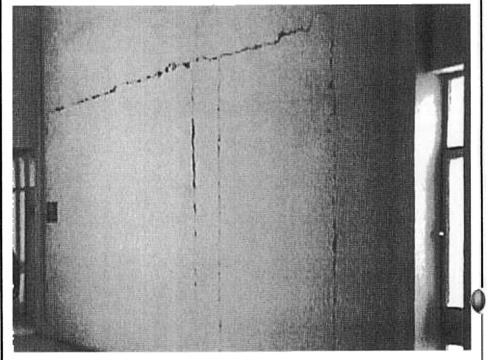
Separation of infill walls at the Çukurova University Medical Facility Hospital Building. Photo: Çelebi
